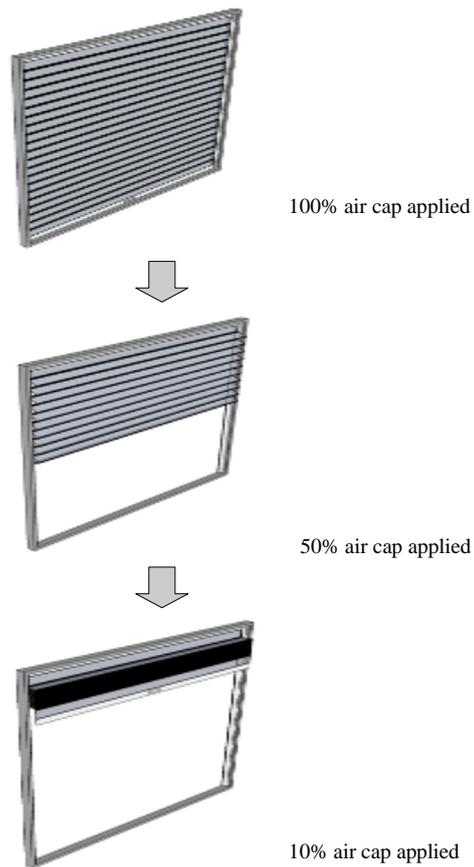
Detailed drawing of window-mounted air cap module using a blind (Horizontal type)
